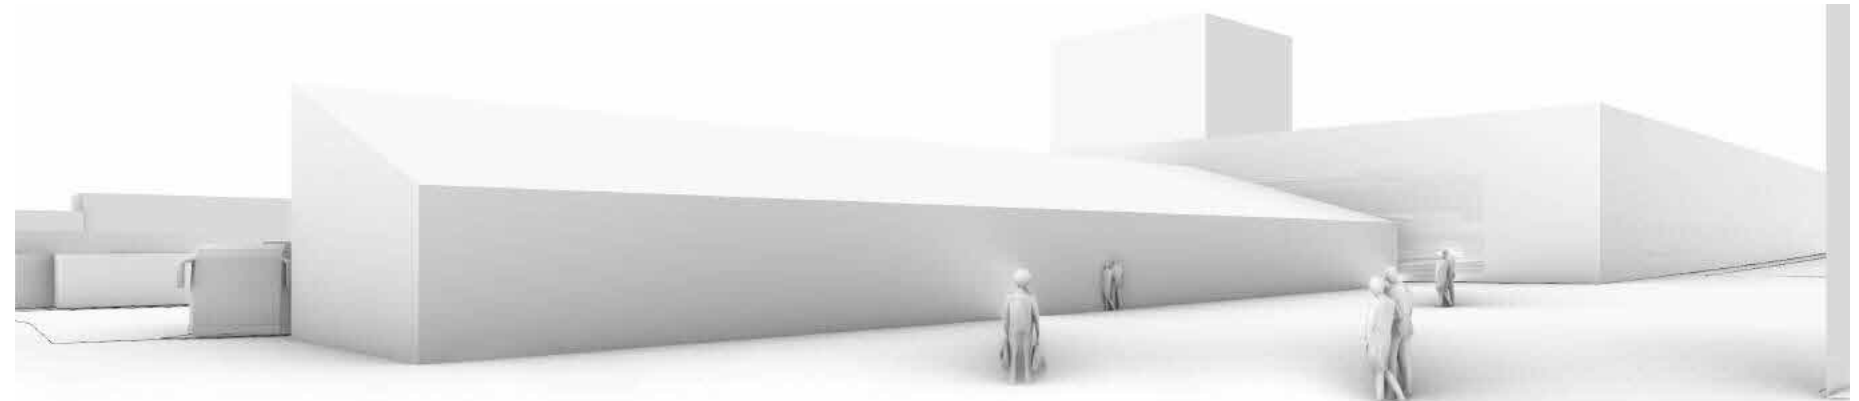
Proposed Monopitch roof orientated towards the bus stands
